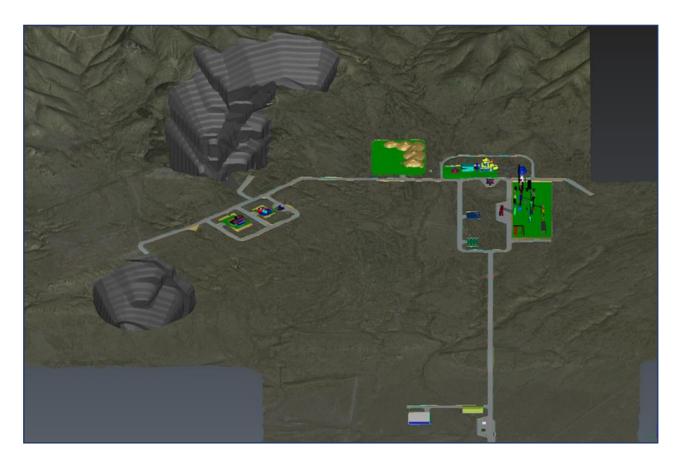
Buena Vista iron ore mining & dry beneficiation plant layout.
